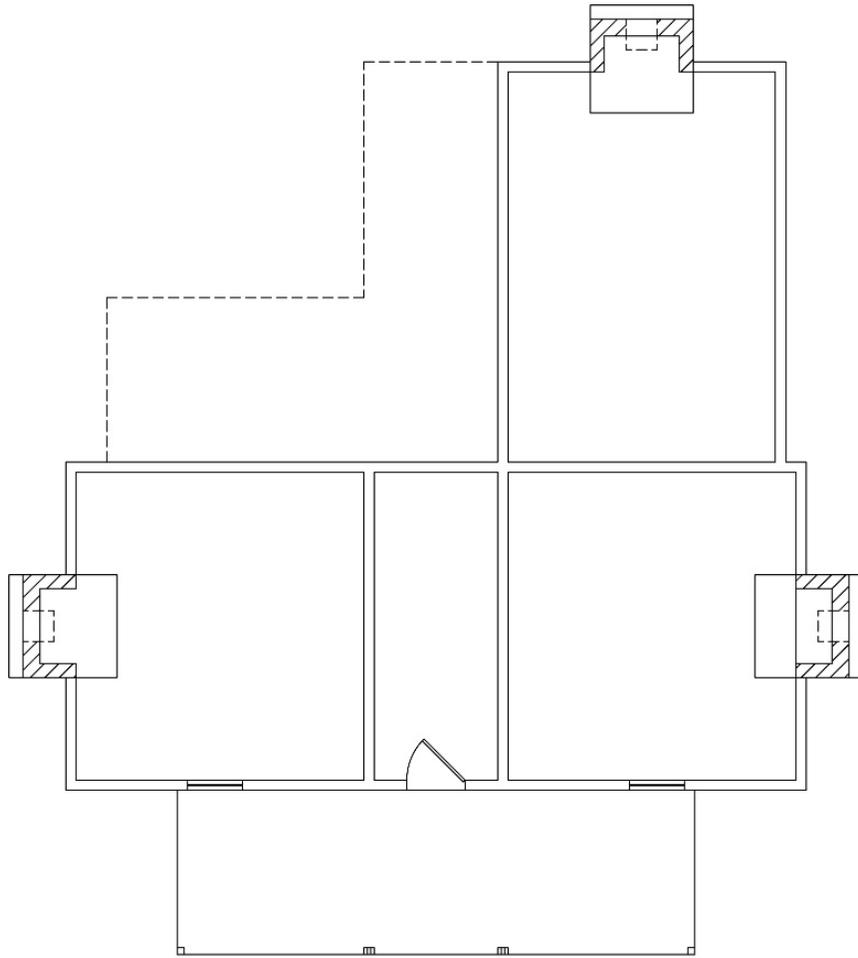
Hinton Homeplace, reconstructed plan. Drawn by David Riddle.
